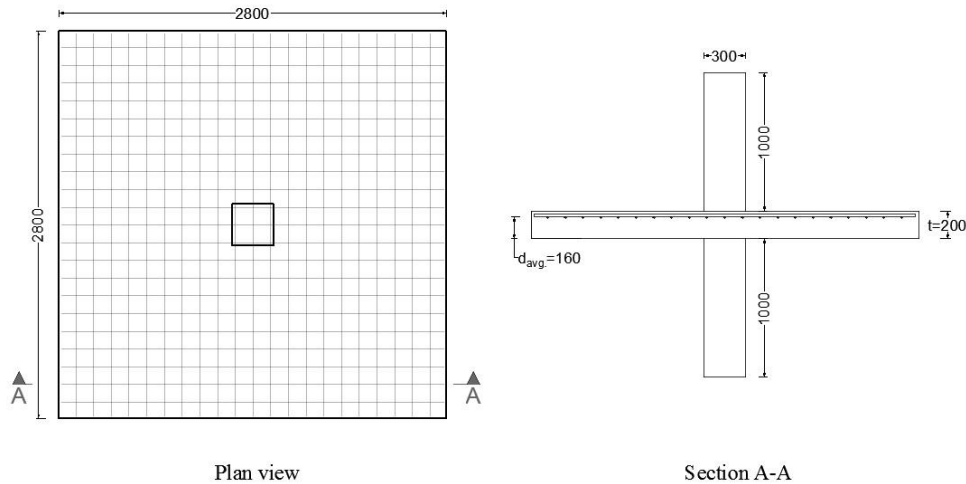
Connections geometry and reinforcement layout for a typical connection (all dimensions in mm)
